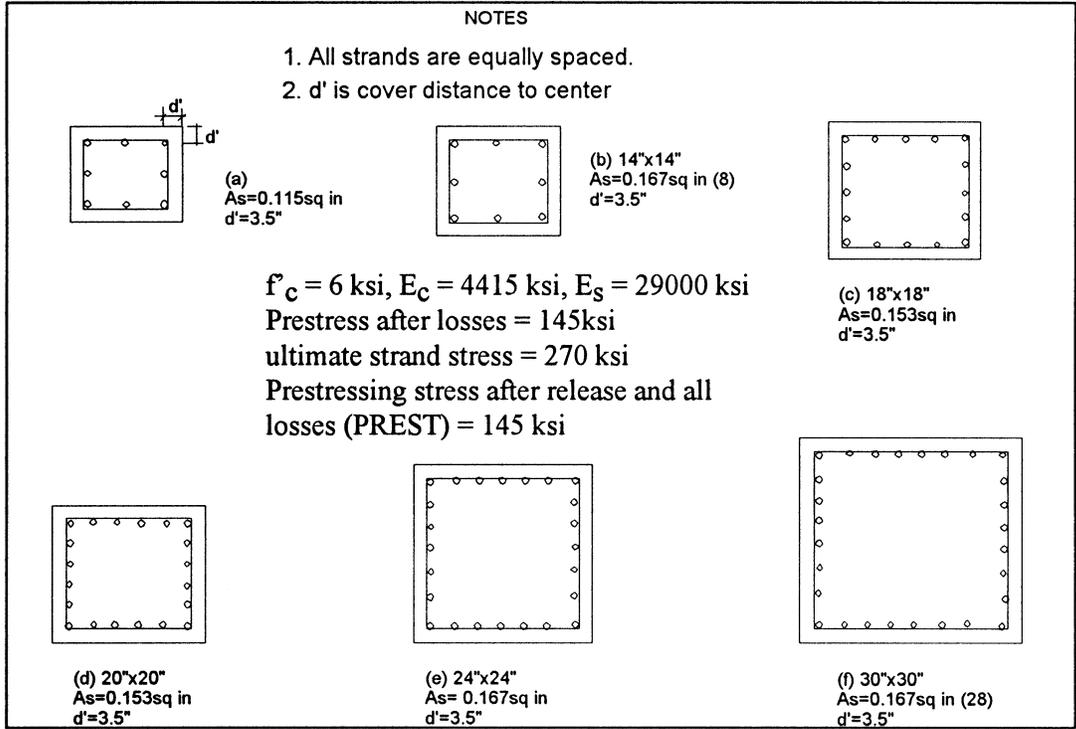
Standard FDOT Prestressed Concrete Pile Sections (English)
